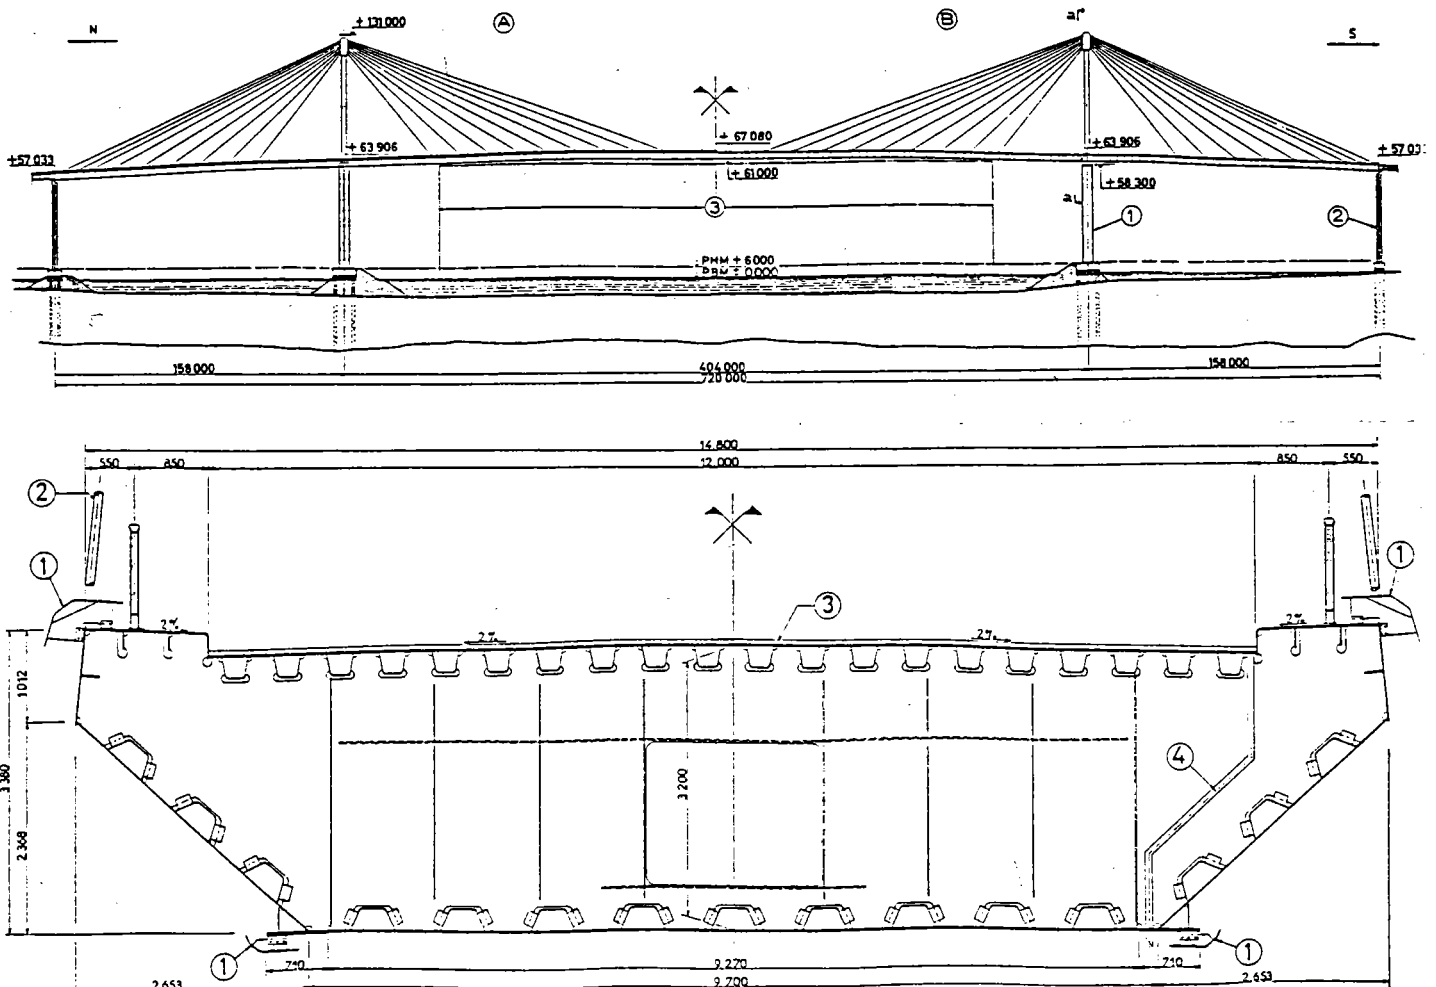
Cross section of the box girder. (1) Deflectors. (2) Cable stay.
